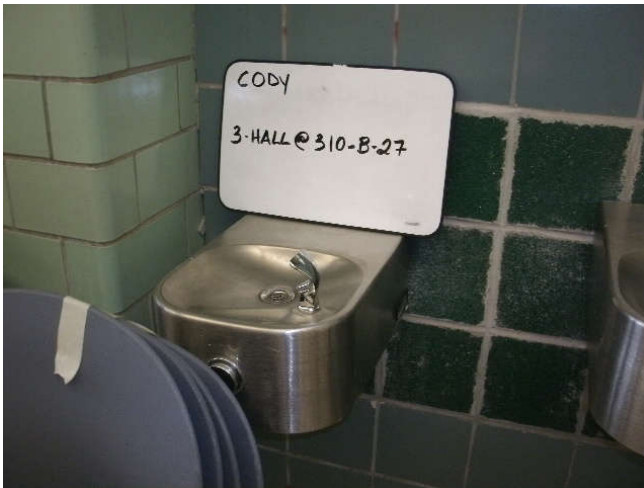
Bubbler, located in a 3rd floor hall, across from room 310 – left fixture.
